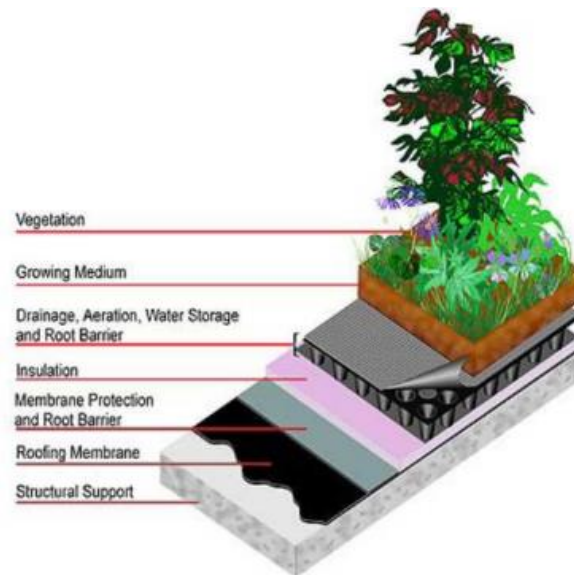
Green Roof structure (Foster et. al. 2011)
